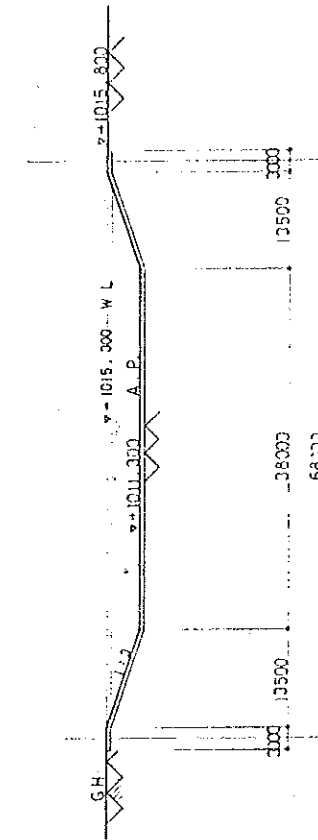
TRANSVERSE AND VERTICAL SECTION
